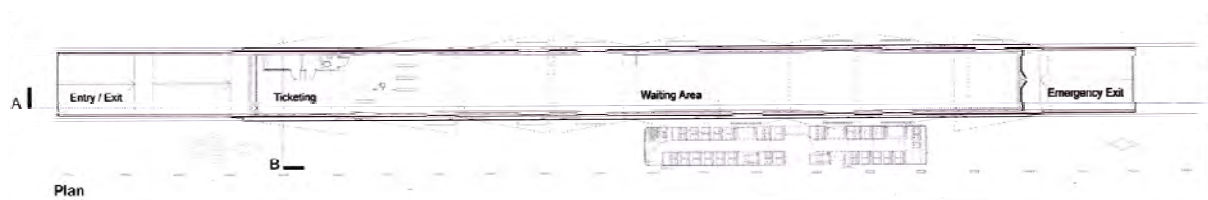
Typical Rea Vaya station plan. (Manning, 2009: 129)
